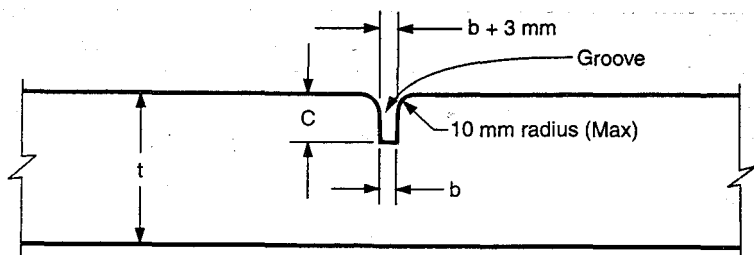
Details of groove to form part of expansion joint of Fig. 5.5, or as an independent contraction joint.
